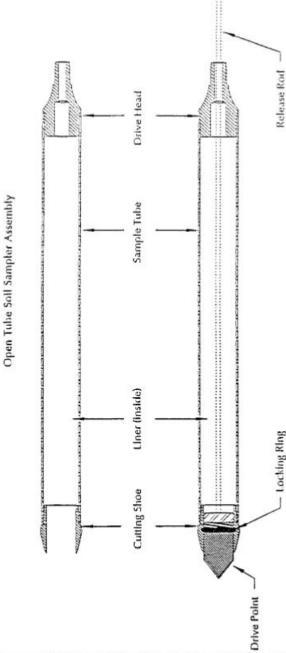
(A) Open and (B) Closed Piston Sampler Assembly, Single Tube System
